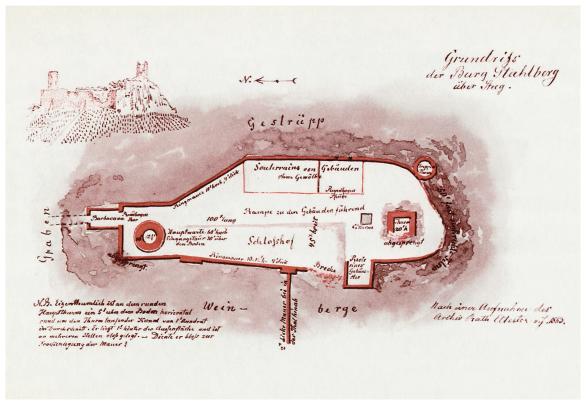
Castle Stahlberg, plan from Leopold von Eltester, 1863.
